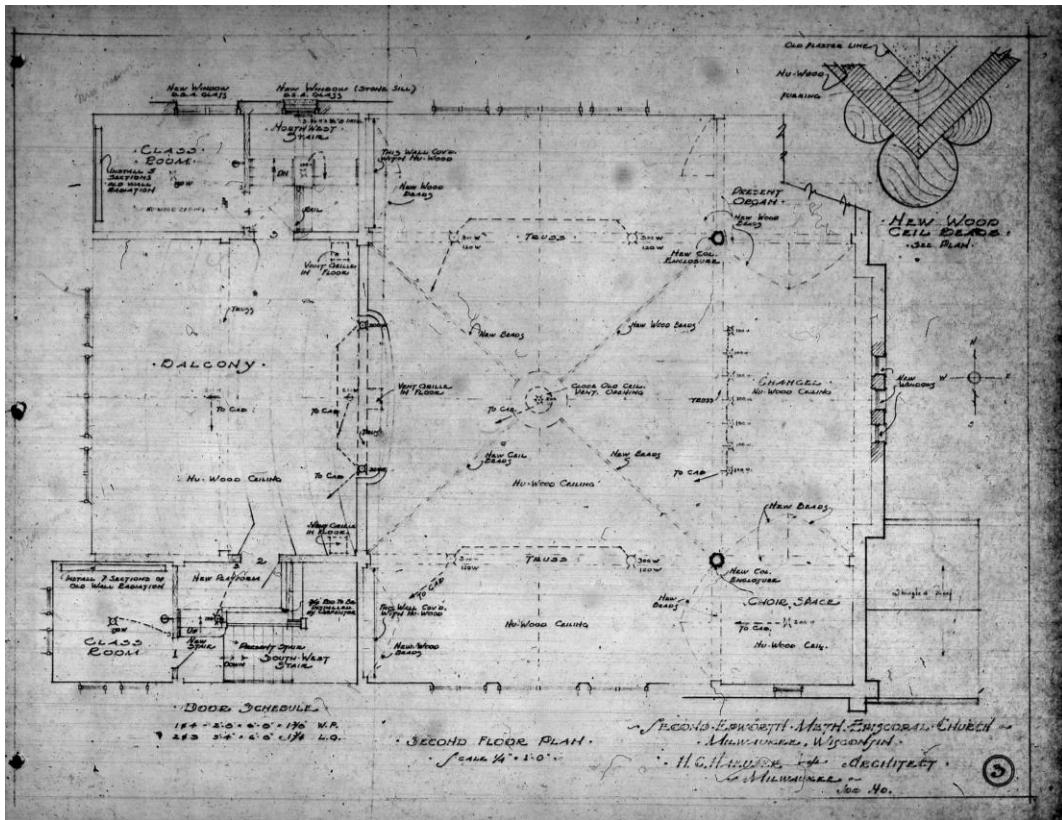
Second floor plan of the church by architect H.C. Haeuser, 1939.
